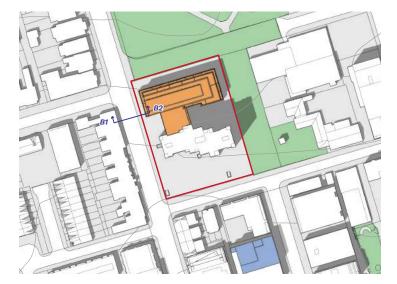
Proposed Site Plan - Setbacks and Separation Distances
